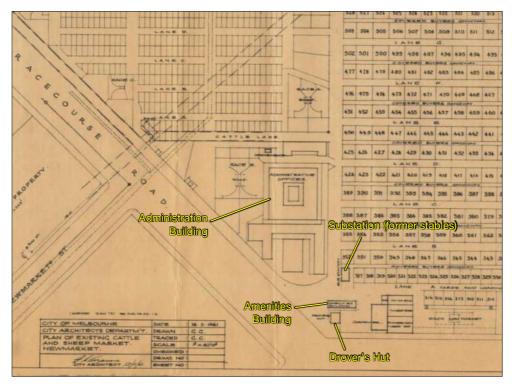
Extract from a 1961 site plan of the Newmarket Saleyards. Source: City of Melbourne Library.
